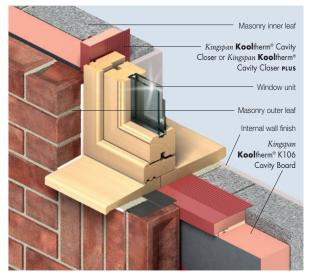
Kingspan Kooltherm® Cavity Closer in a Masonry Cavity Wall Construction with Kingspan Kooltherm® K106 Cavity Board
